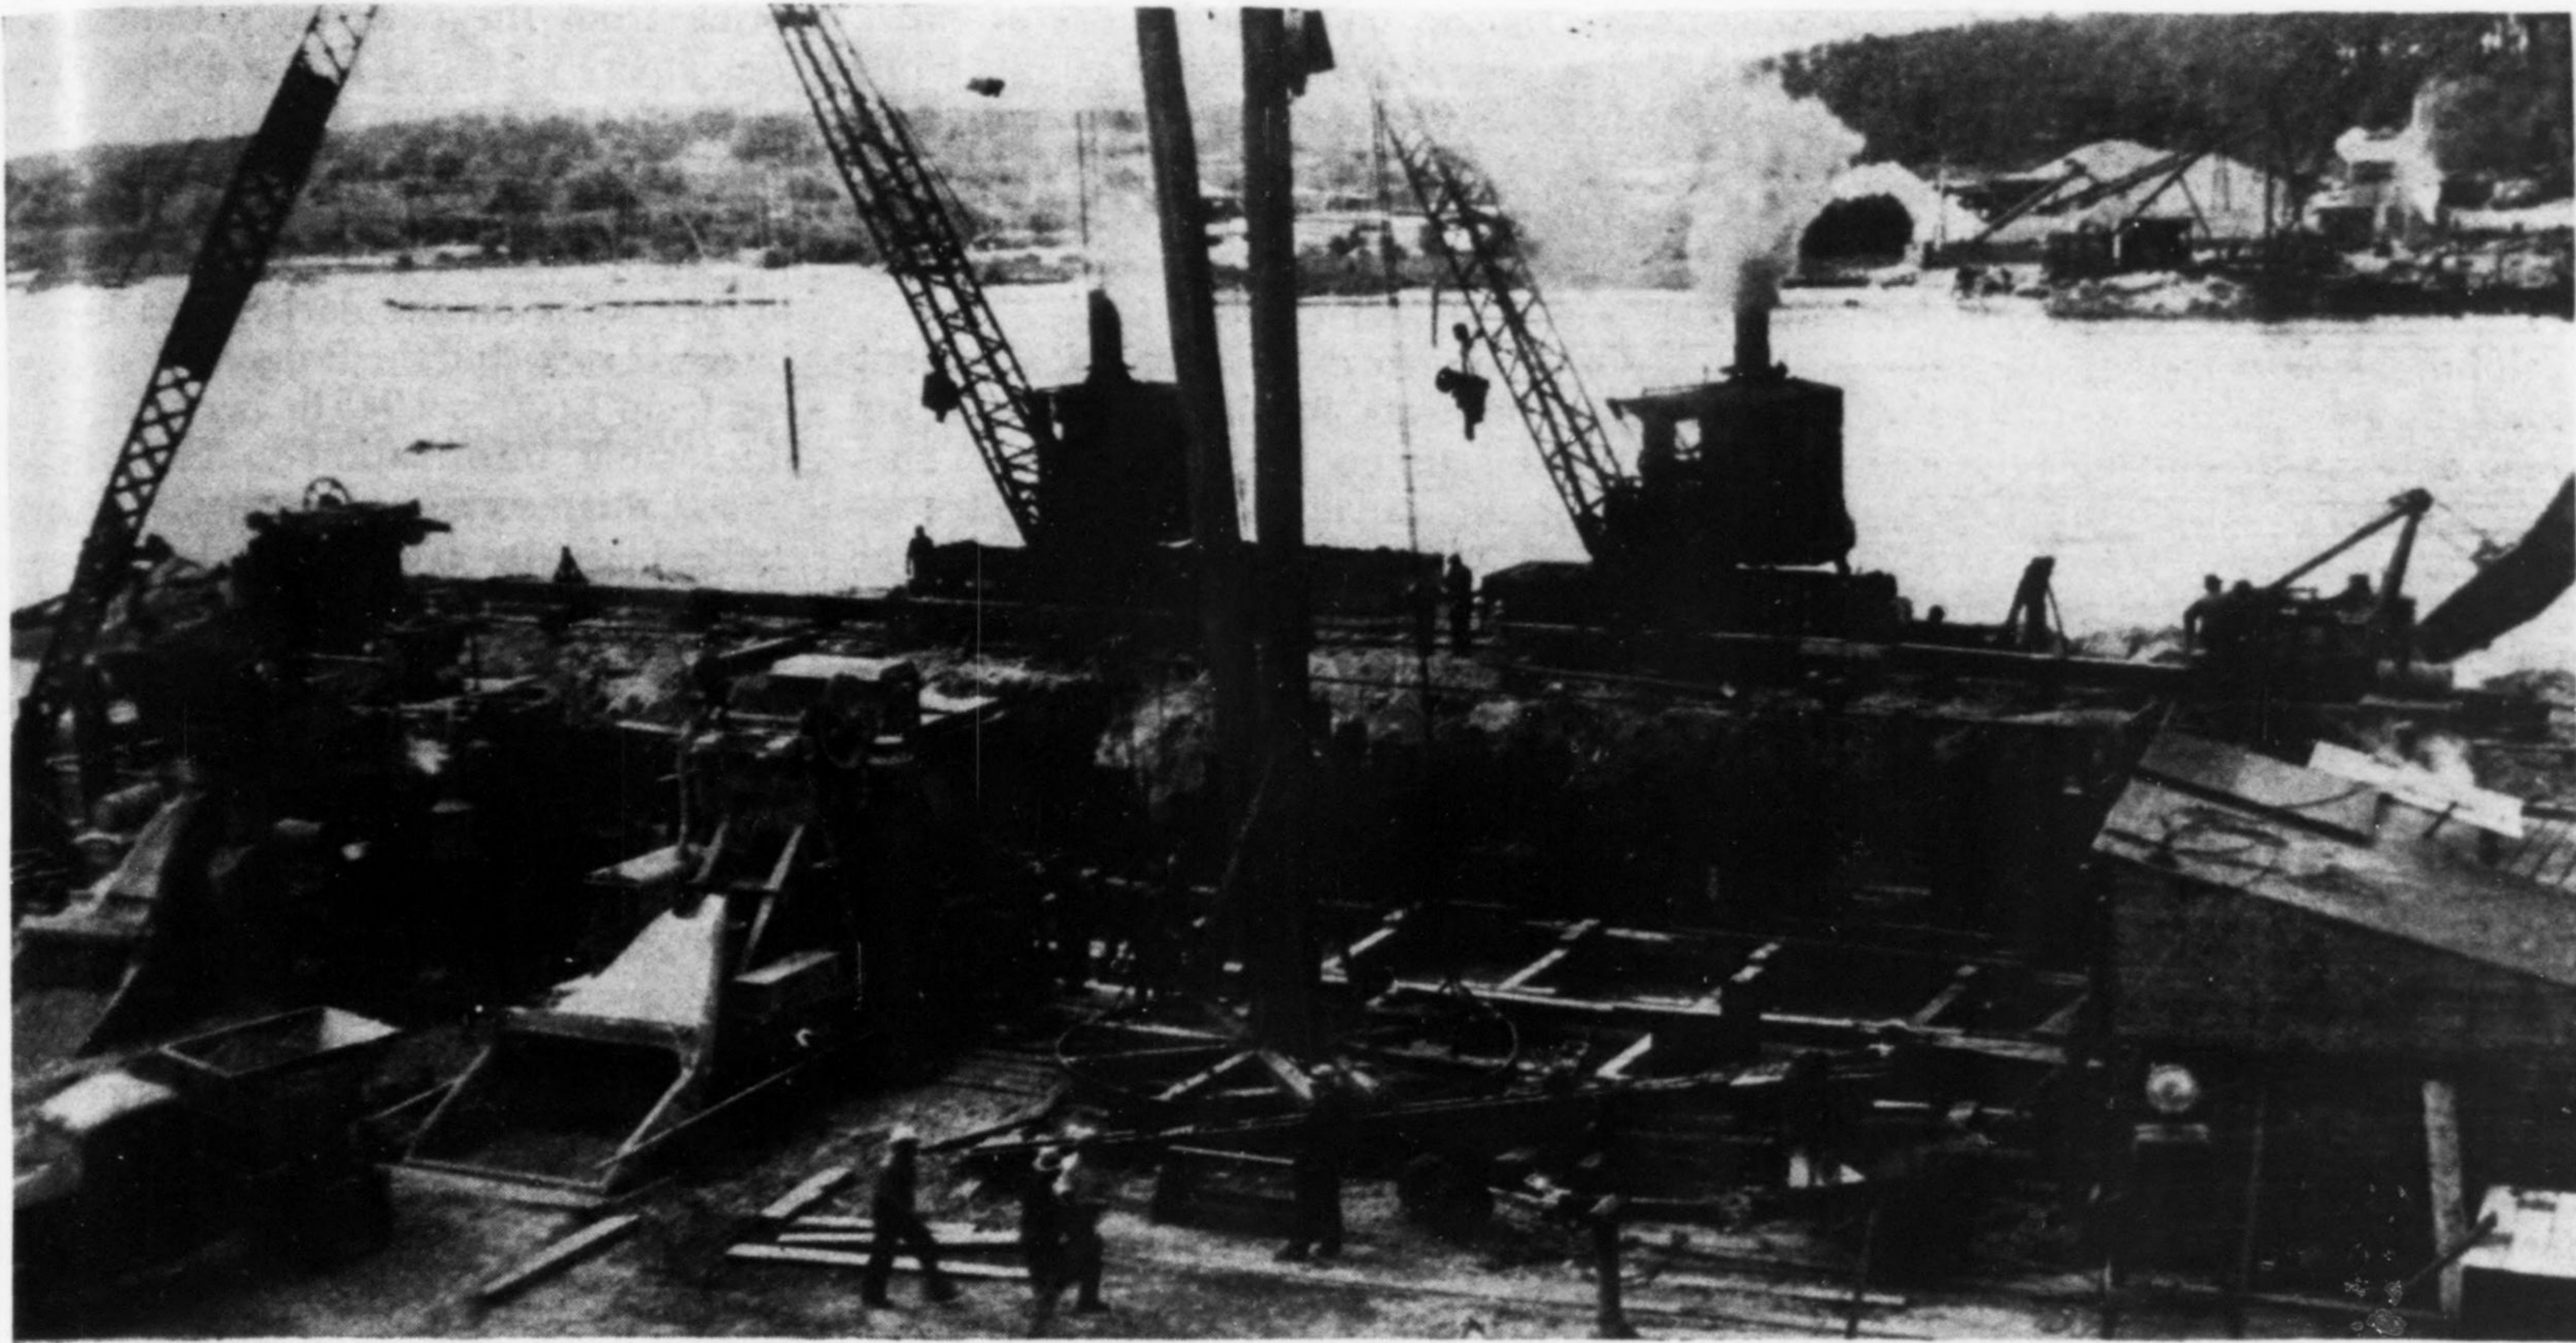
BATTERY of five paving mixers making the 4,300-cu.yd. continuous pour on the seal course of the South Bourne main pier. The mixers discharged into bottom-dump buckets handled by the four derricks and cranes.
